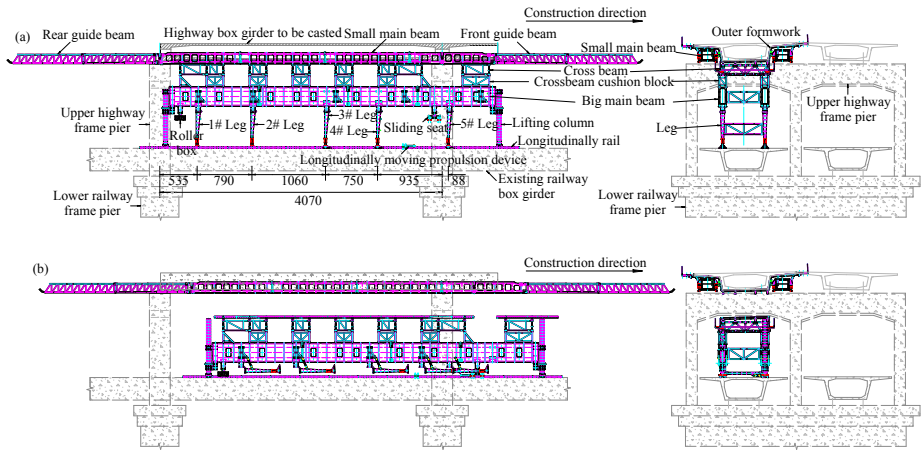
Design of the new split movable scaffolding system (unit: cm): (a) casting condition; (b) hole passing condition.
